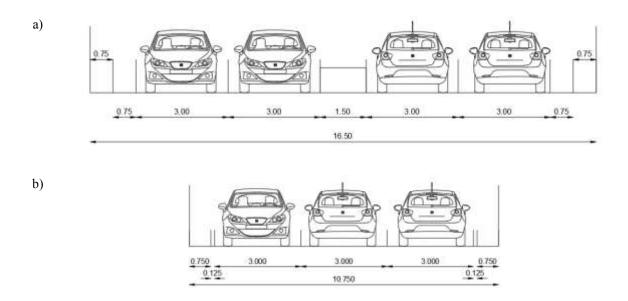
Lane definition for the traffic load computation: Bridge #1 (a) and Bridge #2 (b).
